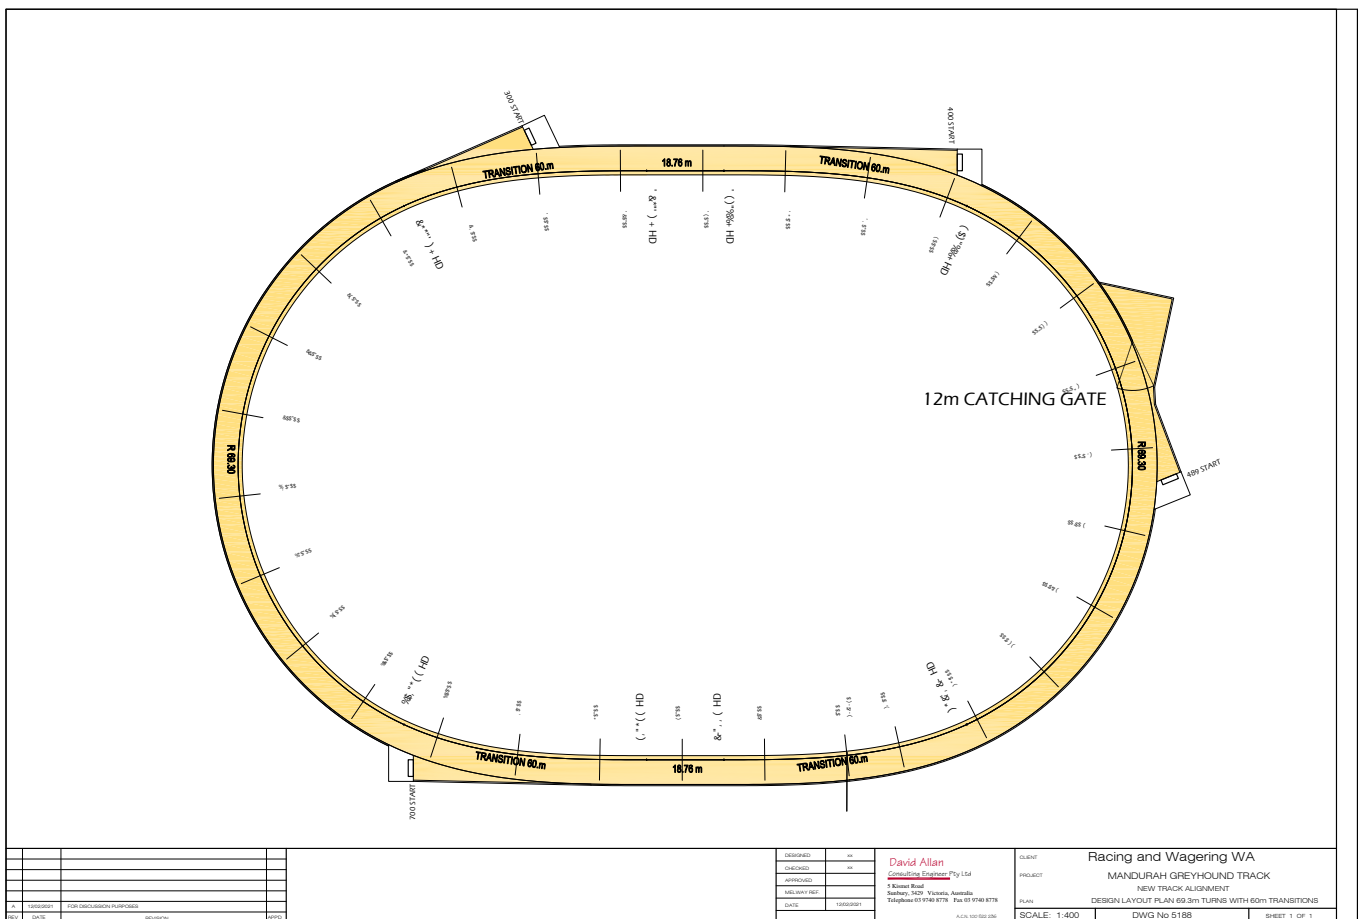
Design 2 Mandurah greyhound track plan David Allan Consulting Engineer Pty Ltd (13 February 2021).
